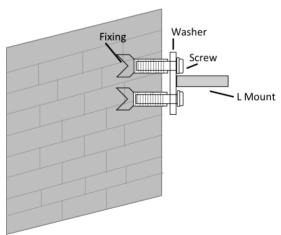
Placement of washer, screw, L mount and fixing
